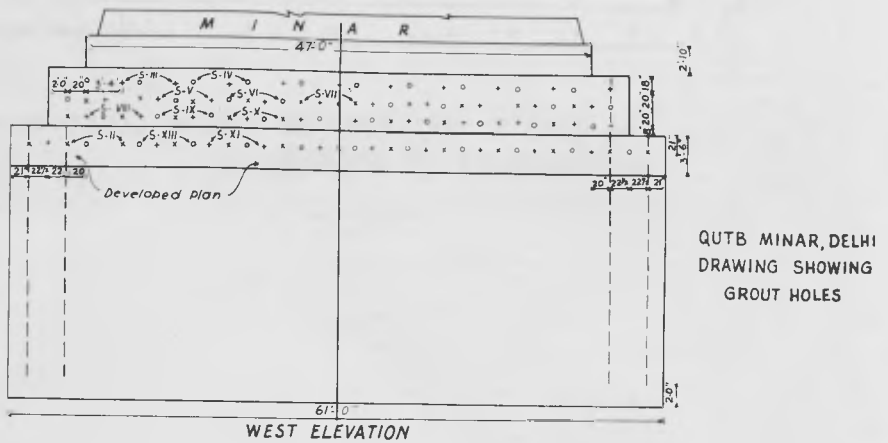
The Qutb Minar: Section of the foundation showing arrangement of grout holes on ashler facing of the plinth
